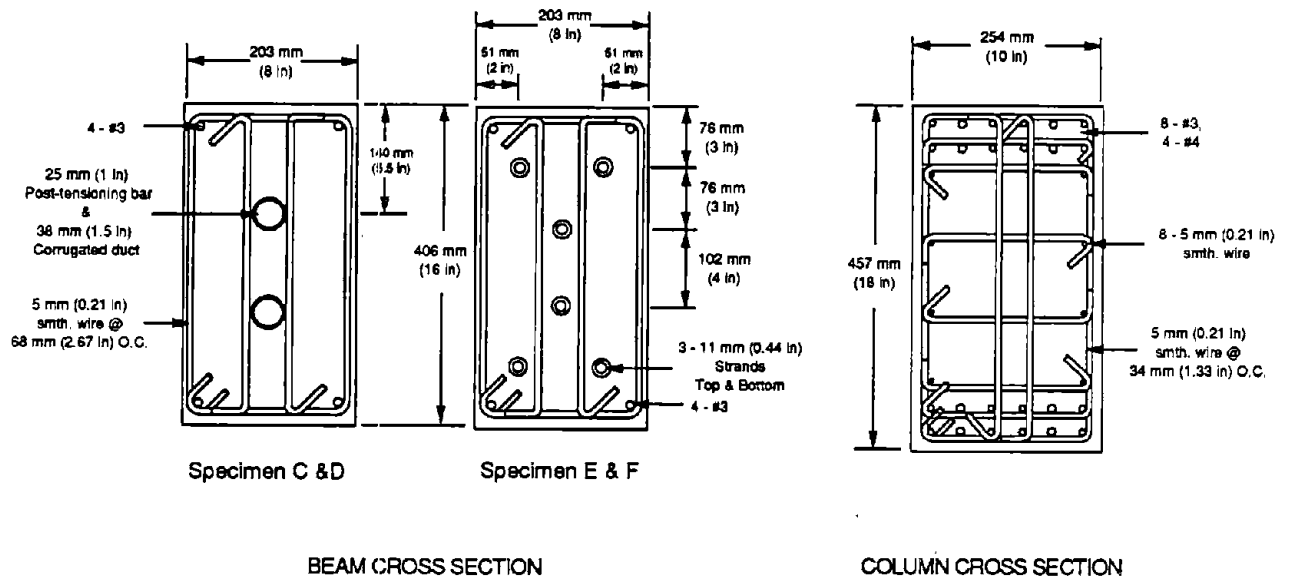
Reinforcement details for precast concrete Zone 4 specimens.
